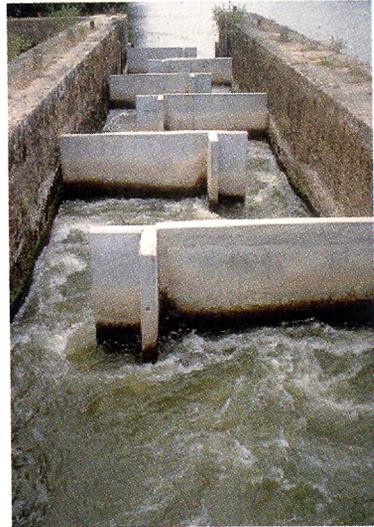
Lateral deep notch fishway at the Sainte-Livrade dam (river Tarn). This large fishway has been installed in a former navigation lock.
